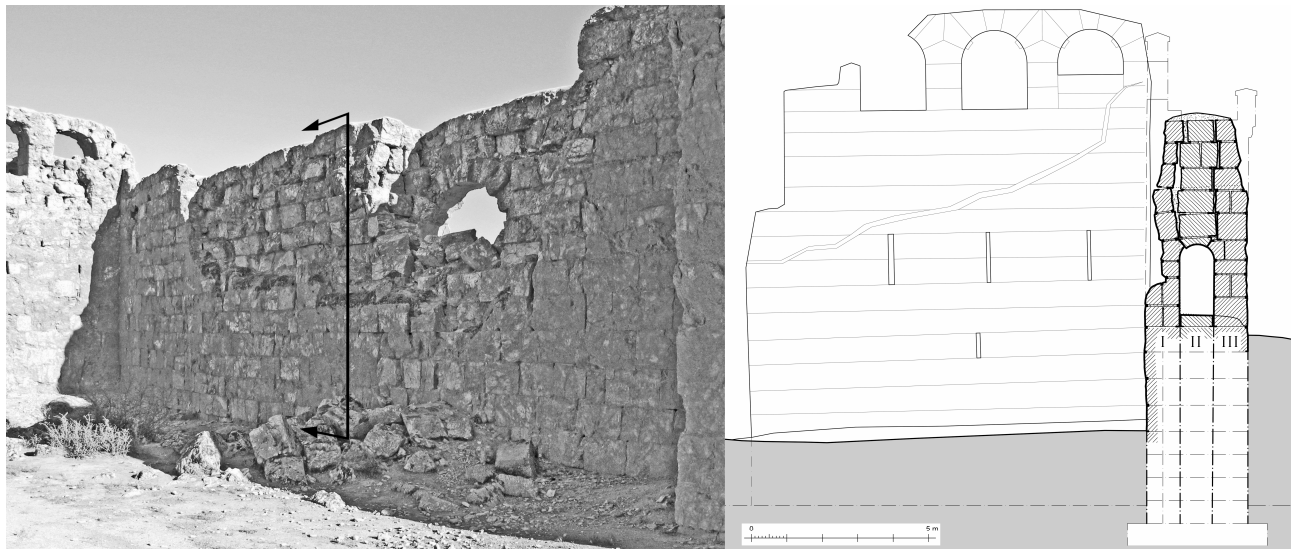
Resafa city wall, north wall between towers 23 and 24; view from north west (left), transverse section viewing east towards tower 23 (right)
